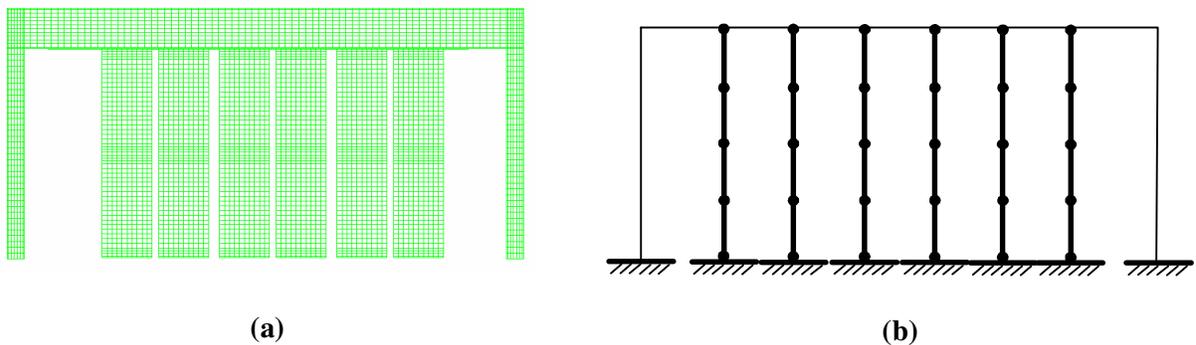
Single-bay finite element models with the retrofit system; plane stress finite element model (a) and beam element model without panel springs (b)
